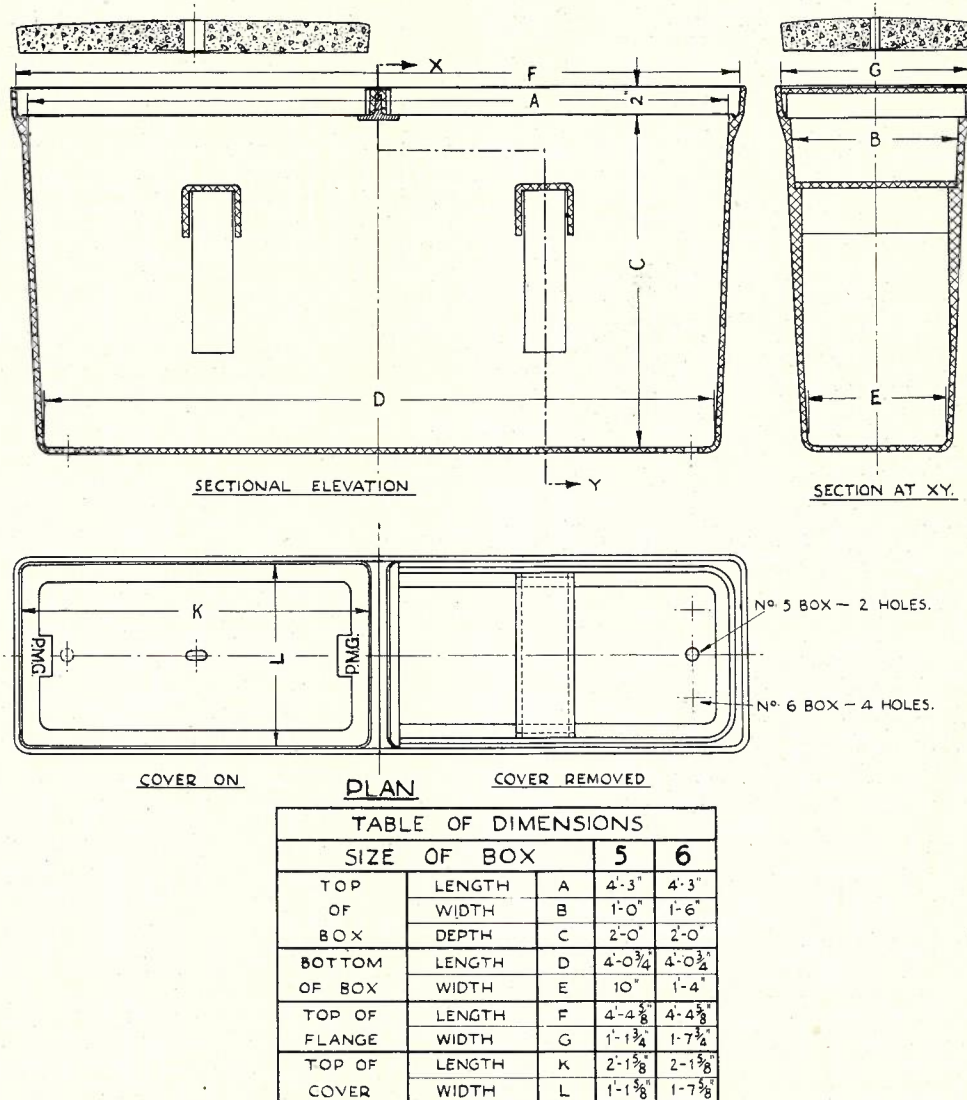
Precast Jointing Pits, Sizes Nos. 5 and 6.
